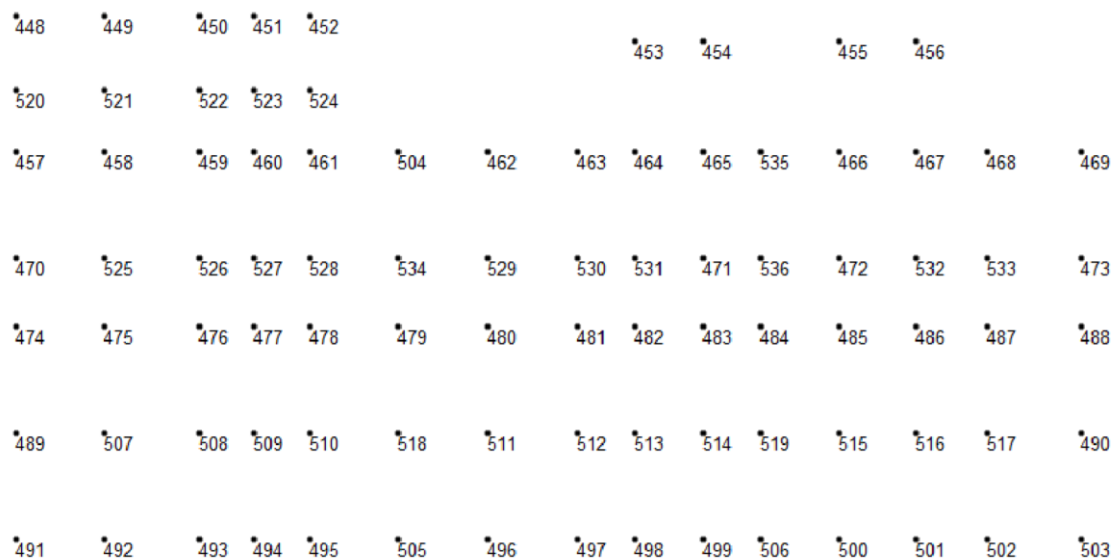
Layout of Footings of Administrative and Q. C. Building in STAAD Pro. V8i Model (*Reference Drawing No. CCA-41*).
